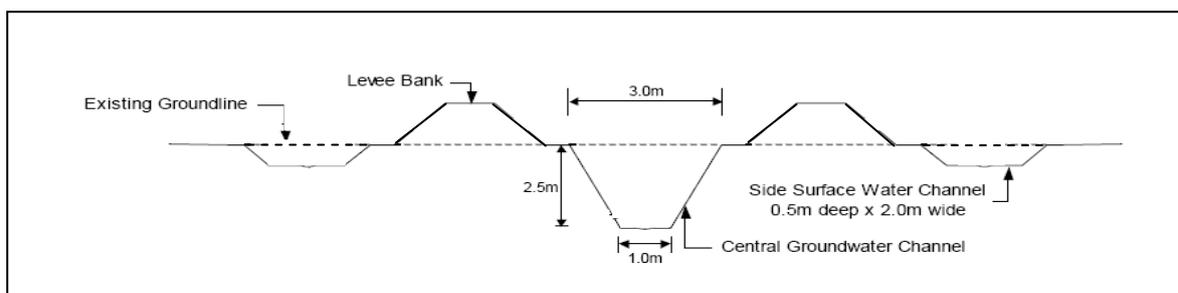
Cross section of proposed drain, showing the separation of groundwater and surface water.
